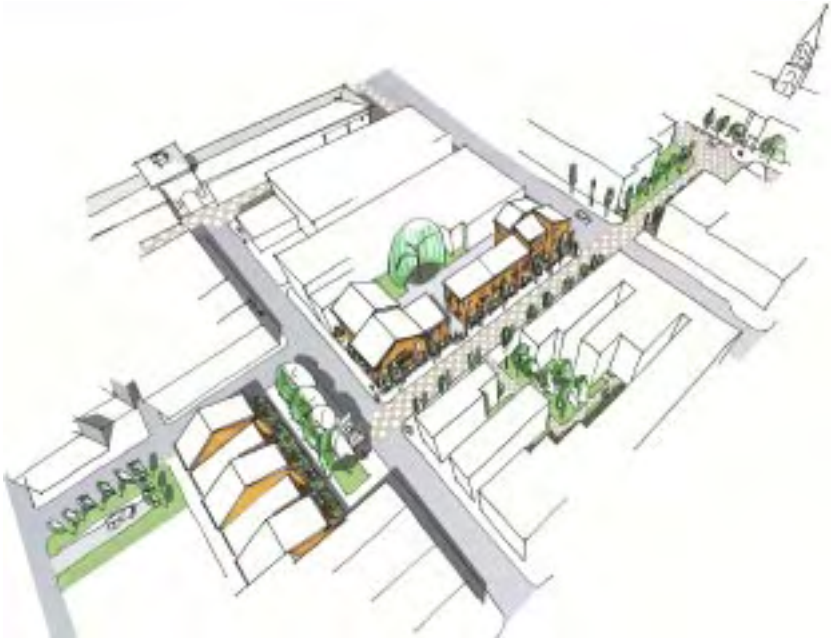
View north over new and existing housing clusters on Pleasant Street. By Consultant - Design Team.
